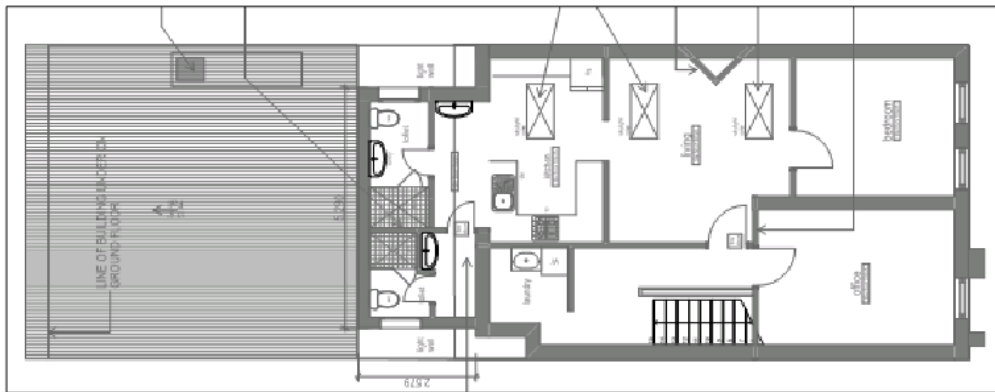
Proposed Ground Floor Layout (with area calculations)
